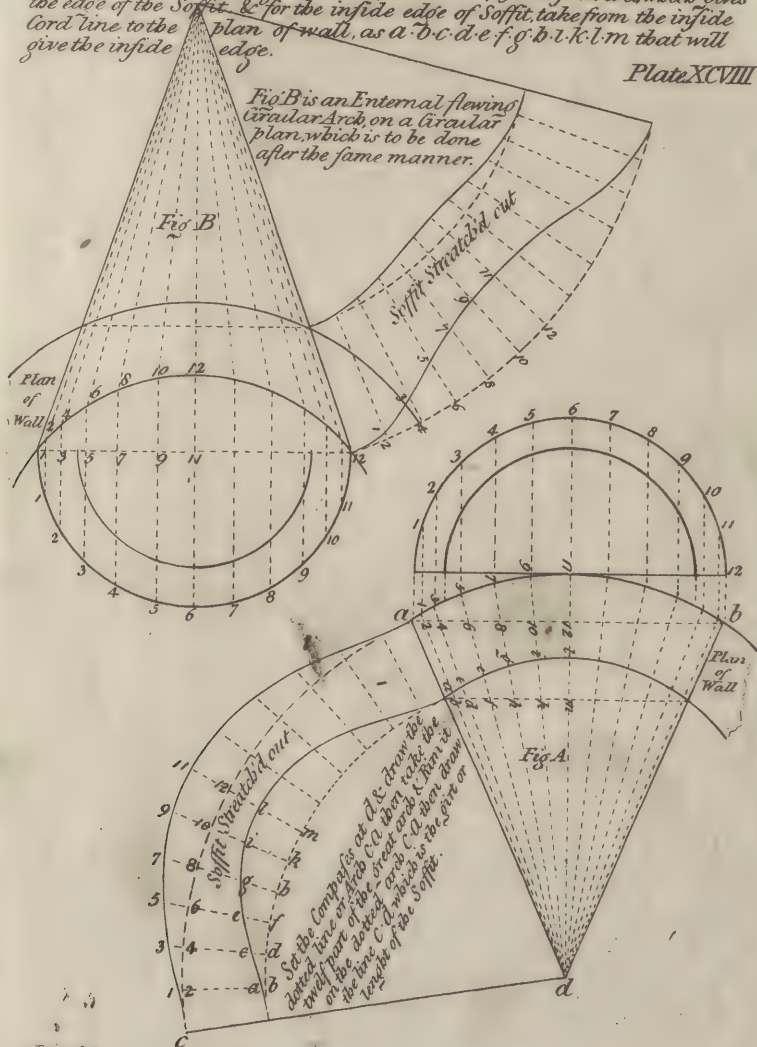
Fig A is an External flowing Soffit in a Circular wall, the inside & outside arches, are both Semi-circular, the Soffits stretch'd out are taken from the Cord line of the opening of the Window or Door a b, to the plan of the Wall, as 1.2.3.4.5.6.7.8.9.10.11.12 & set on the parts of the dotted arch C A, then through those points trace the edge of the Soffit C 1.3.5.7.9.11 & j6 on to a which gives the edge of the Soffit & for the inside edge of Soffit, take from the inside Cord line to the plan of wall, as a d c d e f g b i k l m that will give the inside edge.
